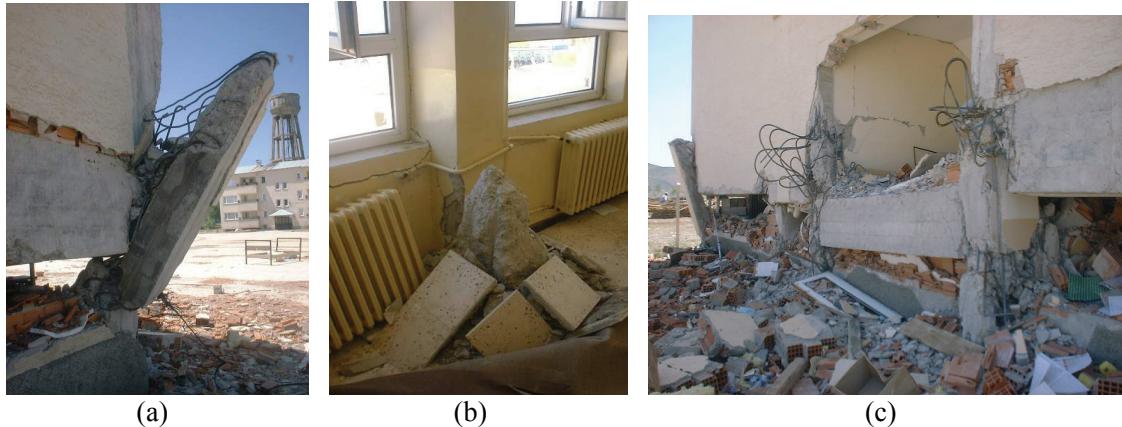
Examples of column-beam joint damages of an earthquake effect in vertical direction
